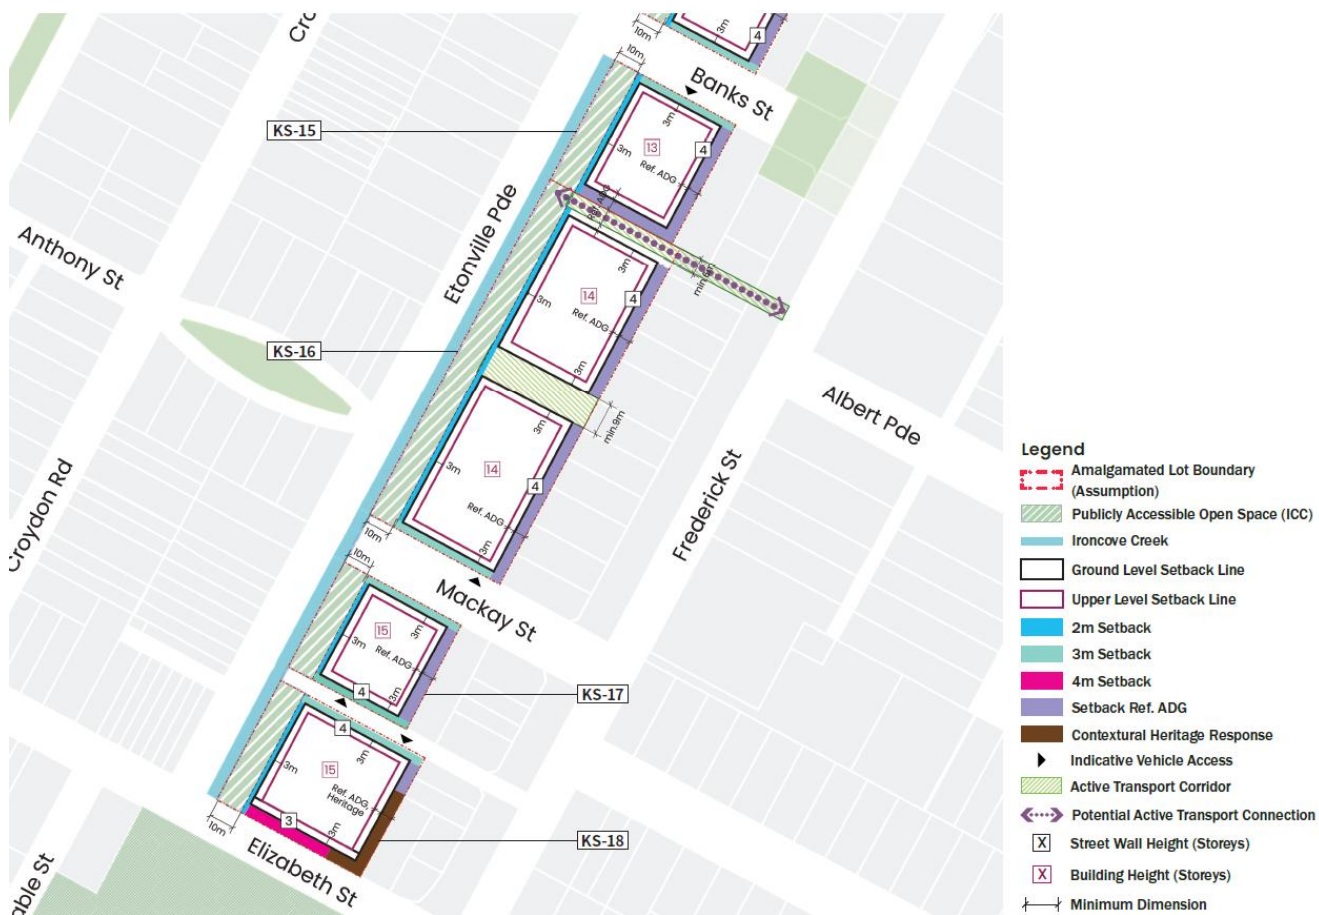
Iron Cove Creek - Indicative Layout and Design Principles
